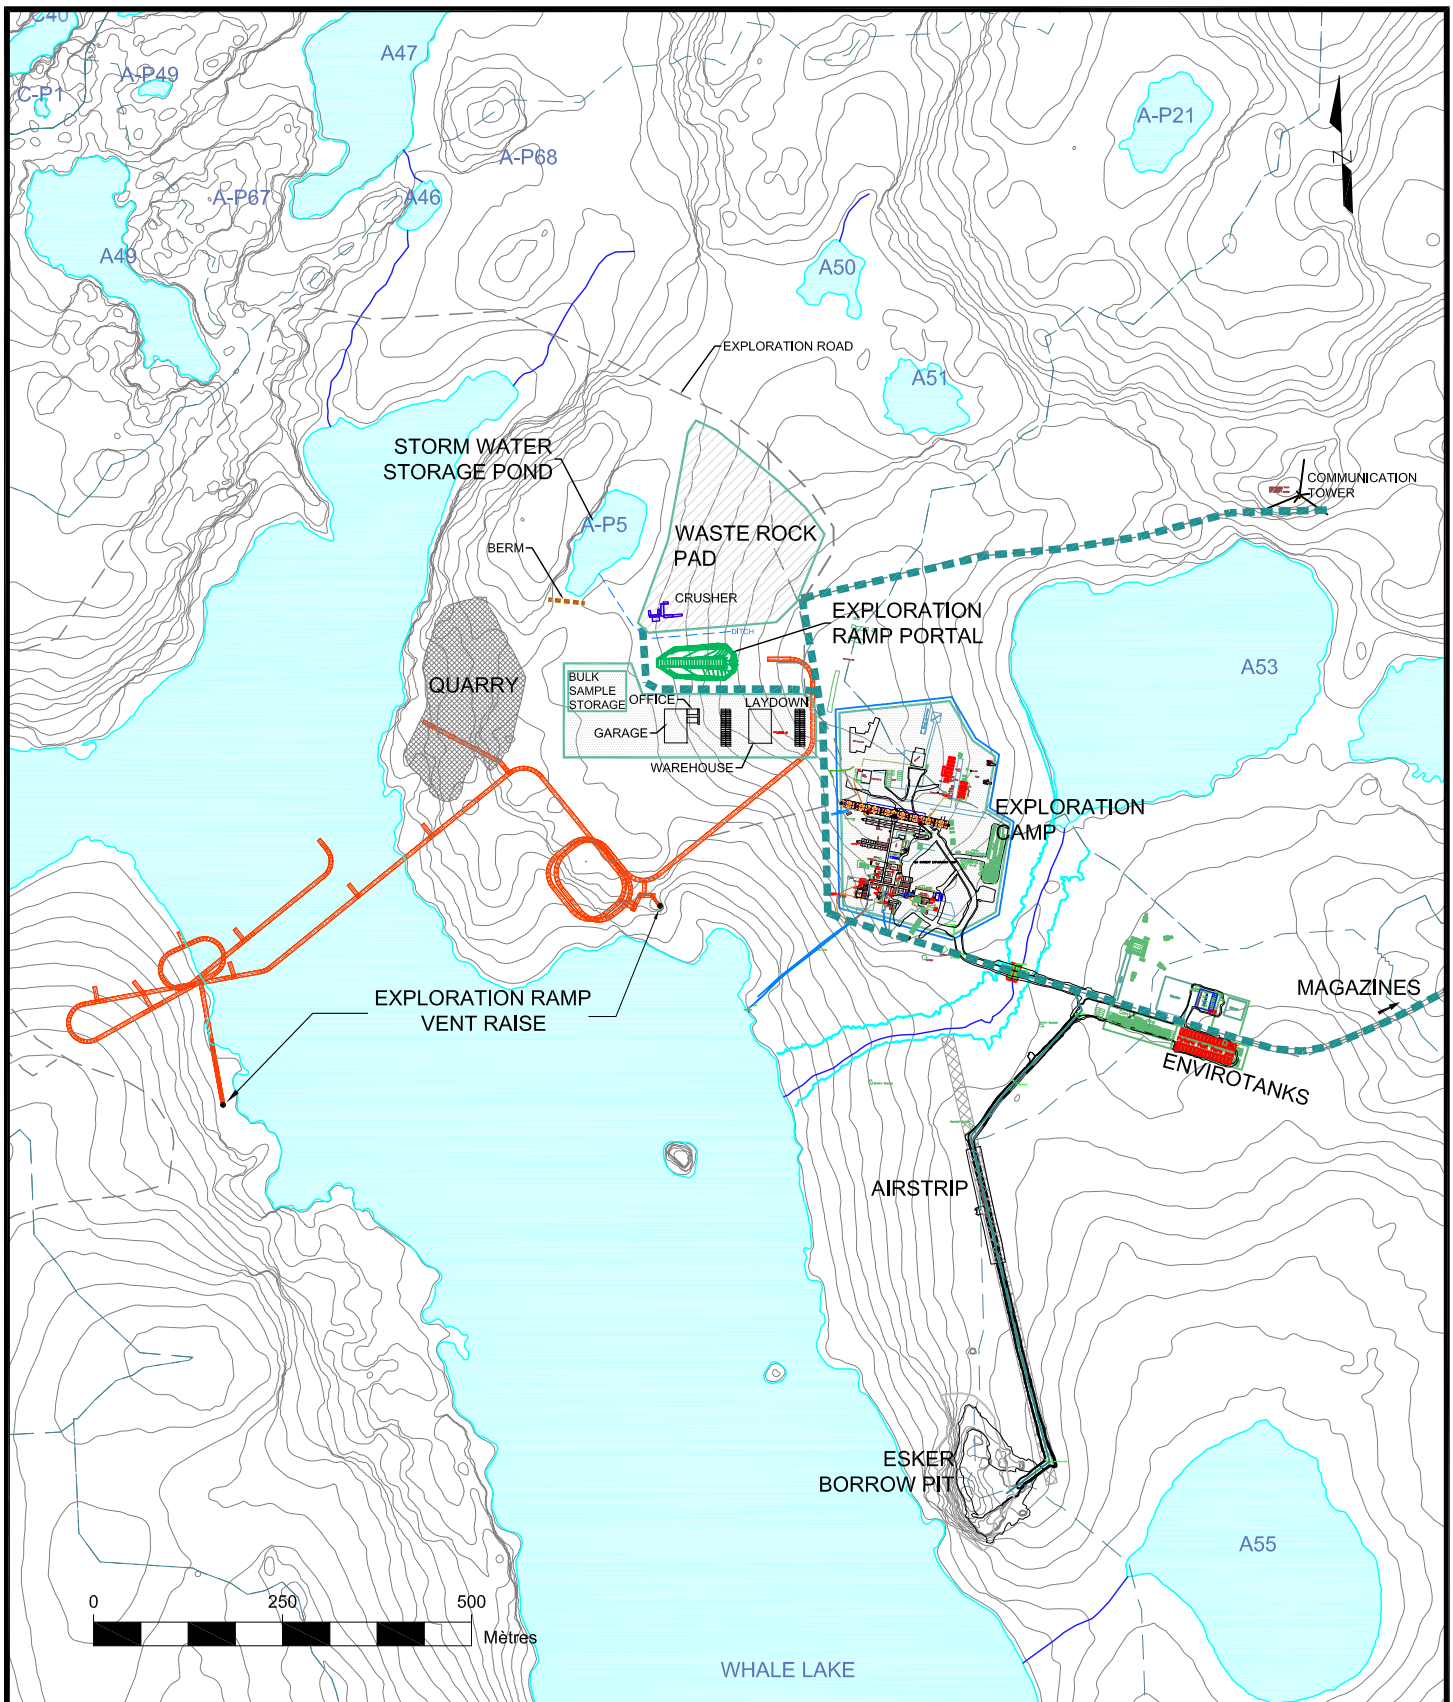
Plan view of future mining infrastructure including the Portal, Ramp and Underground Workings
